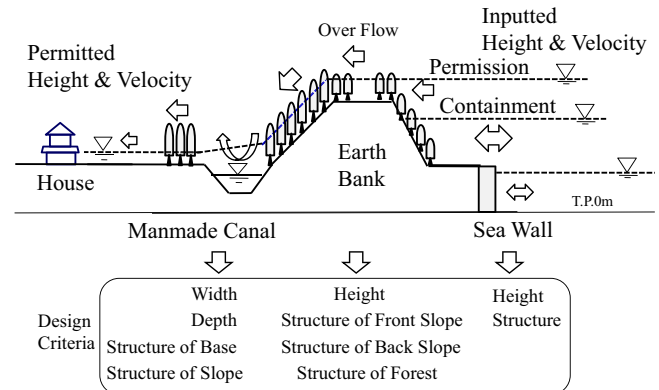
Design concept against tsunami with sea wall, earth bank, and manmade canal.
